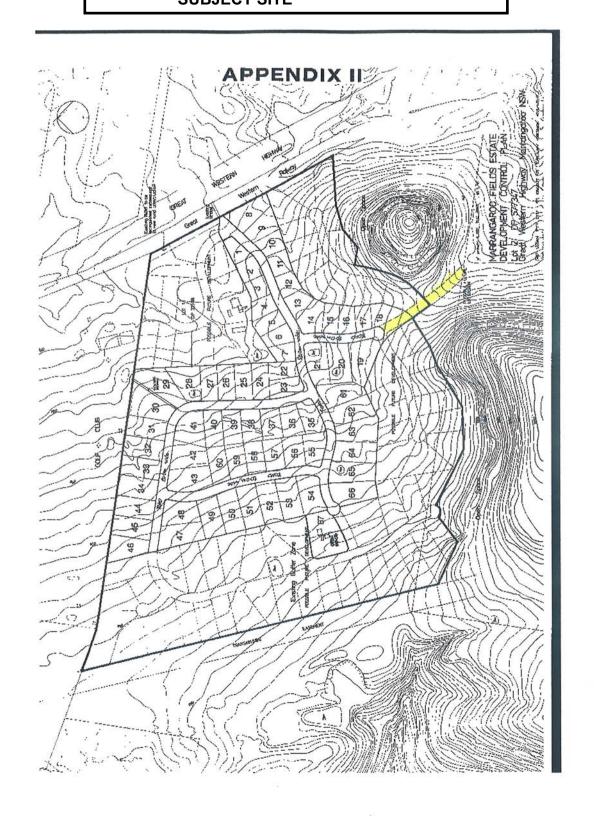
PROPOSED MARRANGAROO STRUCTURE PLAN
